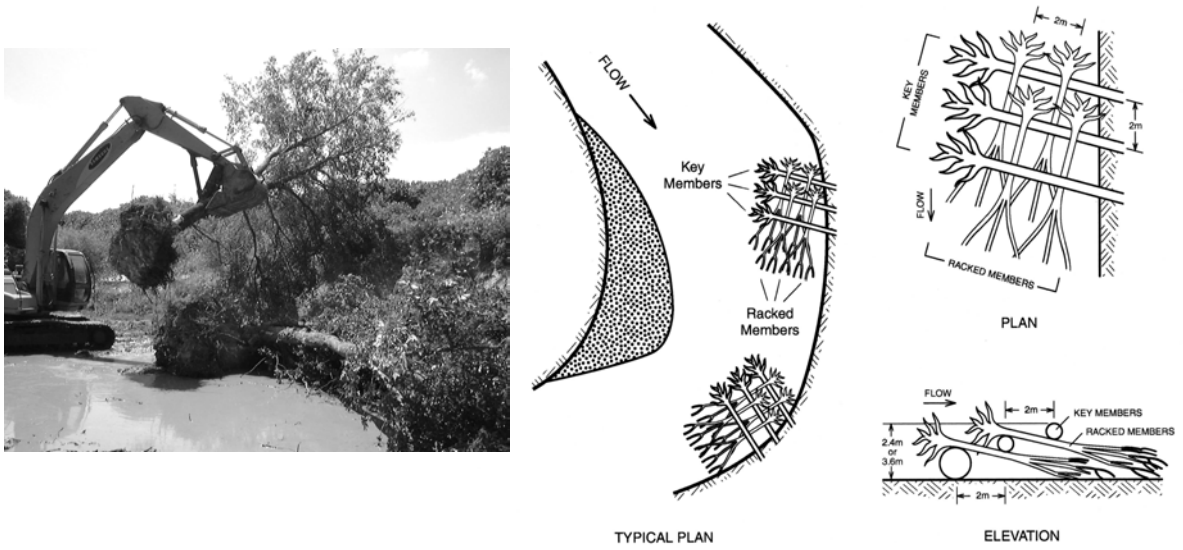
Typical plan and elevation of large woody debris structures. Inset photo shows LWDS under construction.
